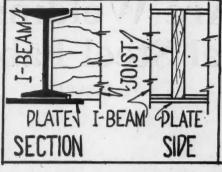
Wood Joist Resting on Steel Plate Attached to Under Side of Lower Flange of Steel Beam. This method is suitable for situations where there is considerable head room that can better be spared from the lower floor than from the upper.
